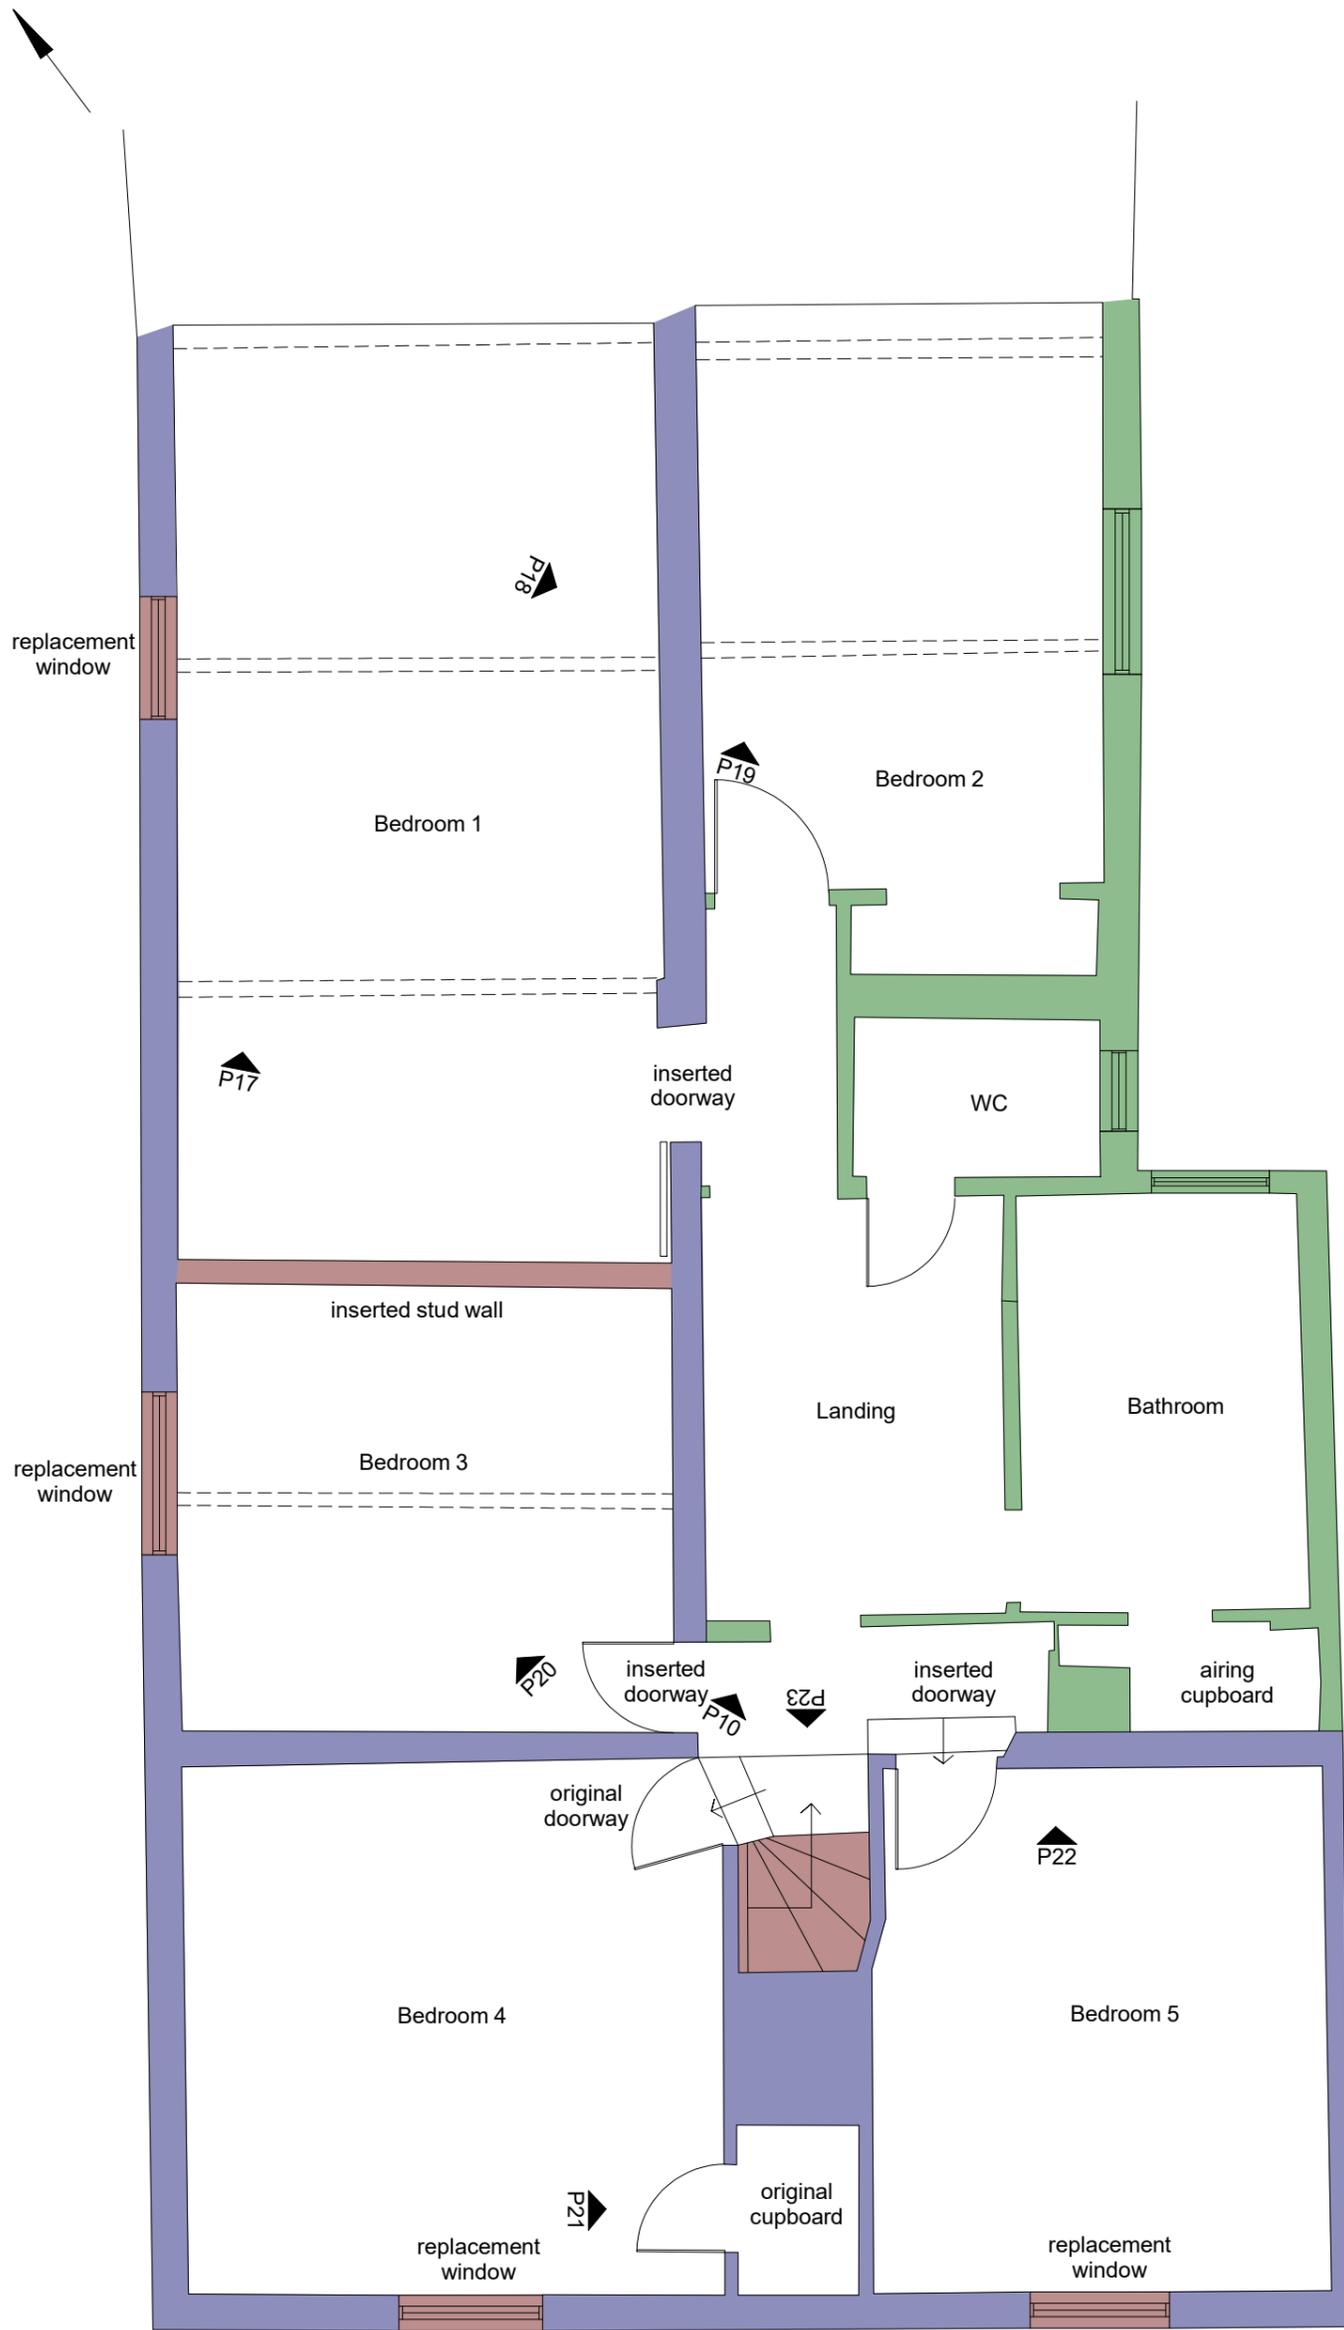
First floor plan. Location and direction of photographs reproduced in report shown.
